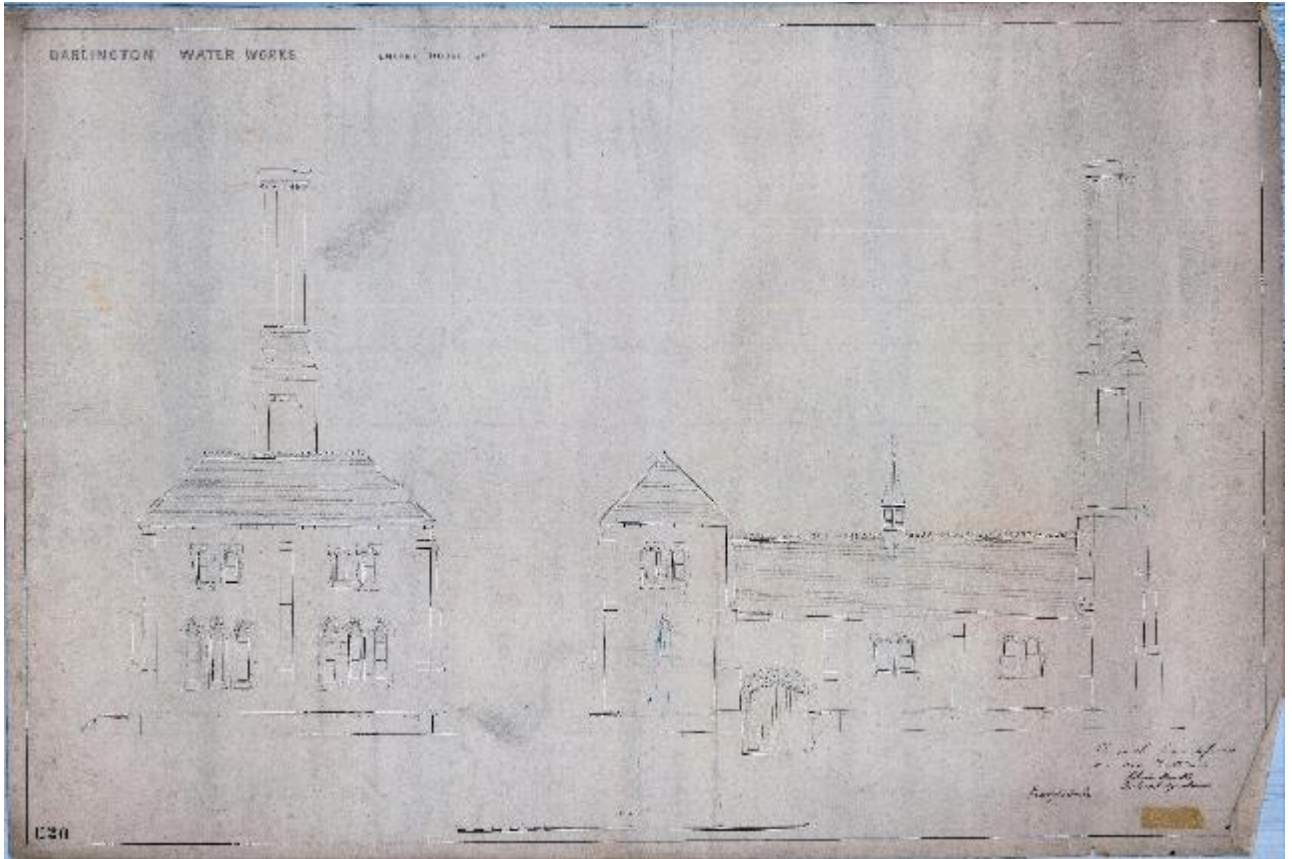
Drawing E20 by Hawksley & Co. dated 1849 and showing alternative proposals of the east and north elevations of the proposed West Engine House. Together with drawing E19 (above), these appear to have been issued as tender documents. The buildings as constructed were adapted and included elements of both drawings. Original drawings are copyright the Science Museum and held in their Wroughton archive ref HAWK2- E20. Below are views of the north elevation as built which includes detailed differences from the Hawksley drawings E19 and E20 above, the main being an additional engine house at the east end.
